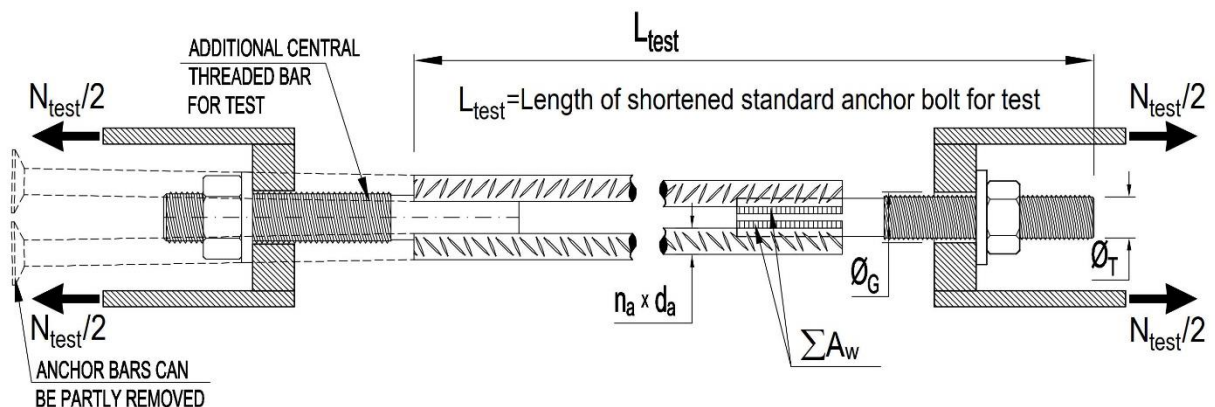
Sectional view of test rig for tension tests with bearing plates at both ends for anchor bolt type 2, series for part with central threaded bar
